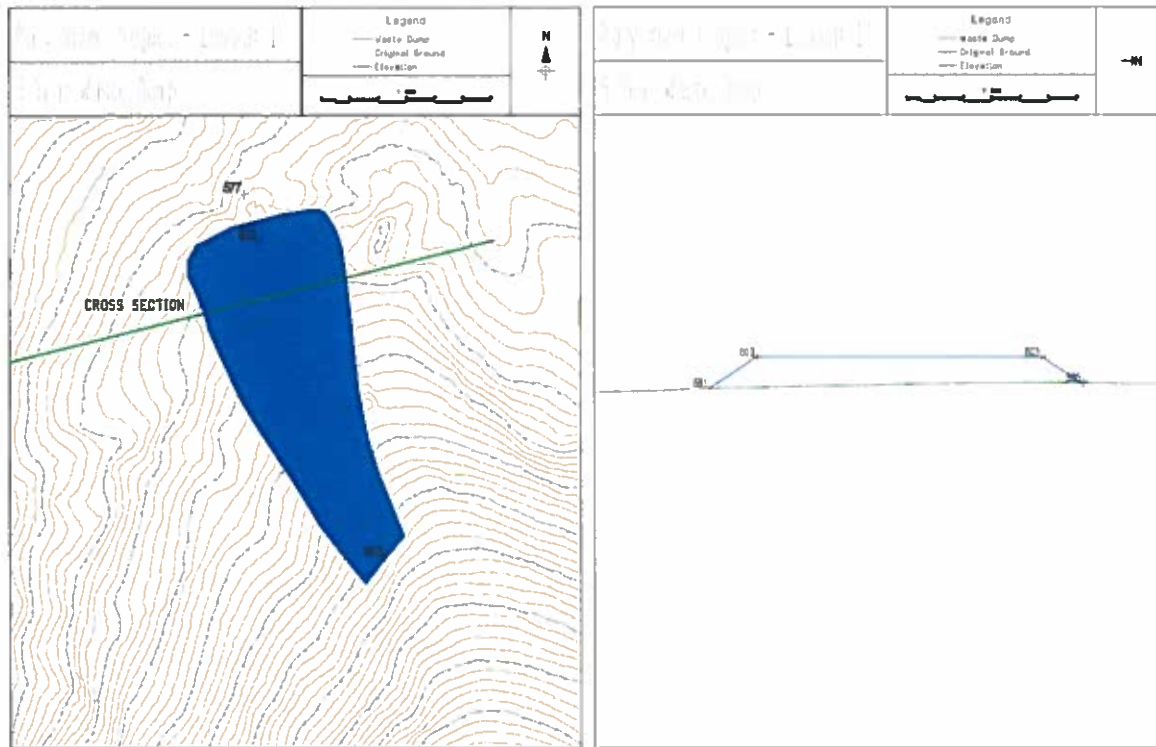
SHOWS A PLAN VIEW OF THE ERP WASTE DUMP (A); AND A CROSS SECTION (B).
